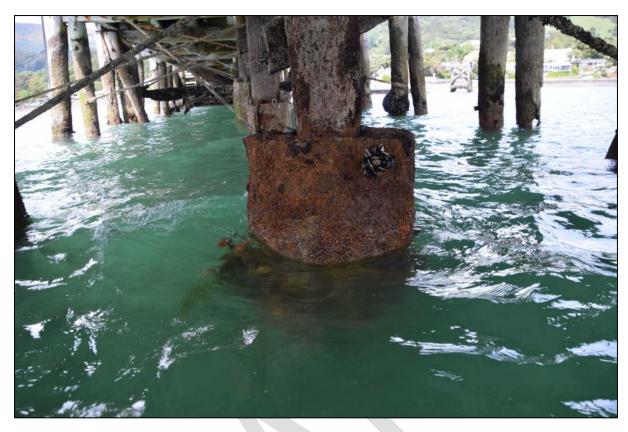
A' jacket' repair to a central pile under the western end of the wharf. The pile has continued to erode above the jacket.
